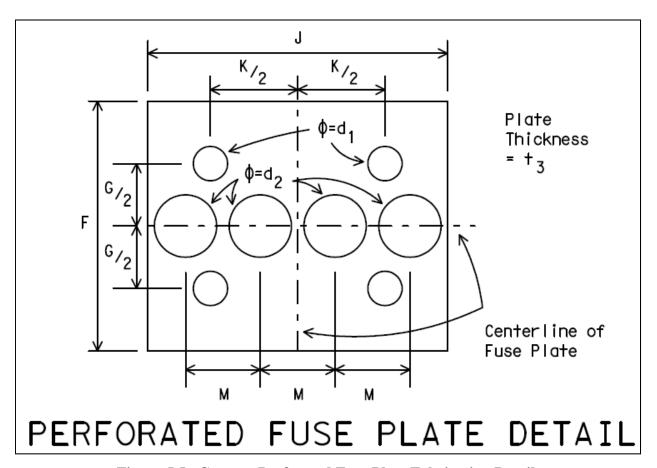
Current Perforated Fuse Plate Fabrication Detail.
